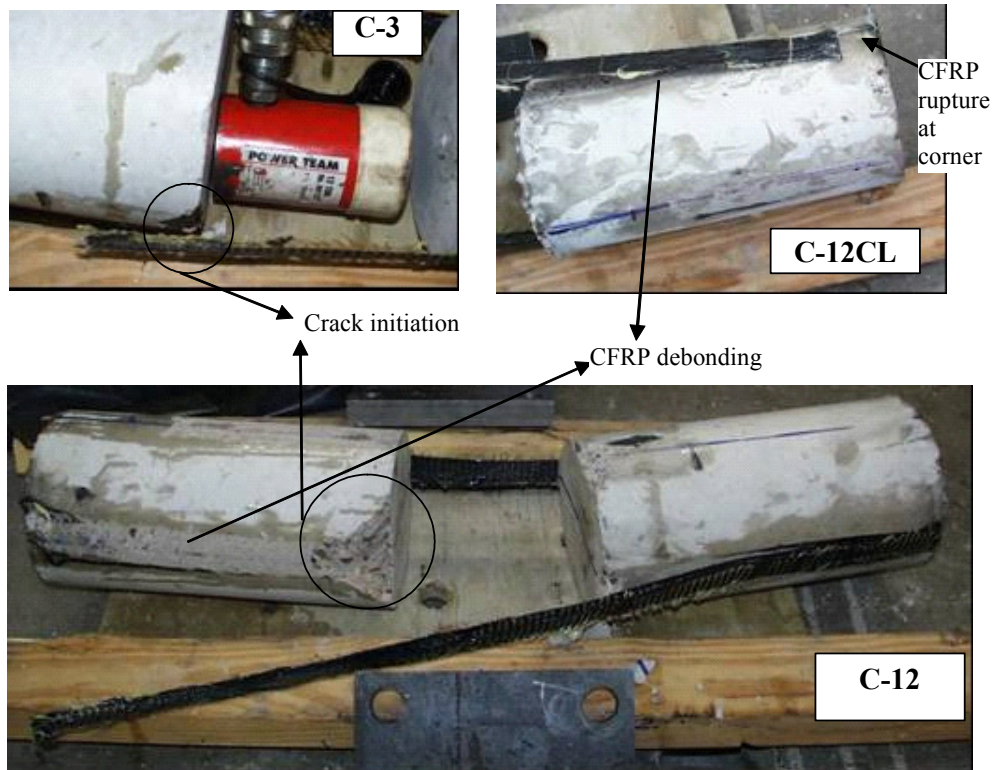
Failure of Anchorage Specimens (C-Series)
